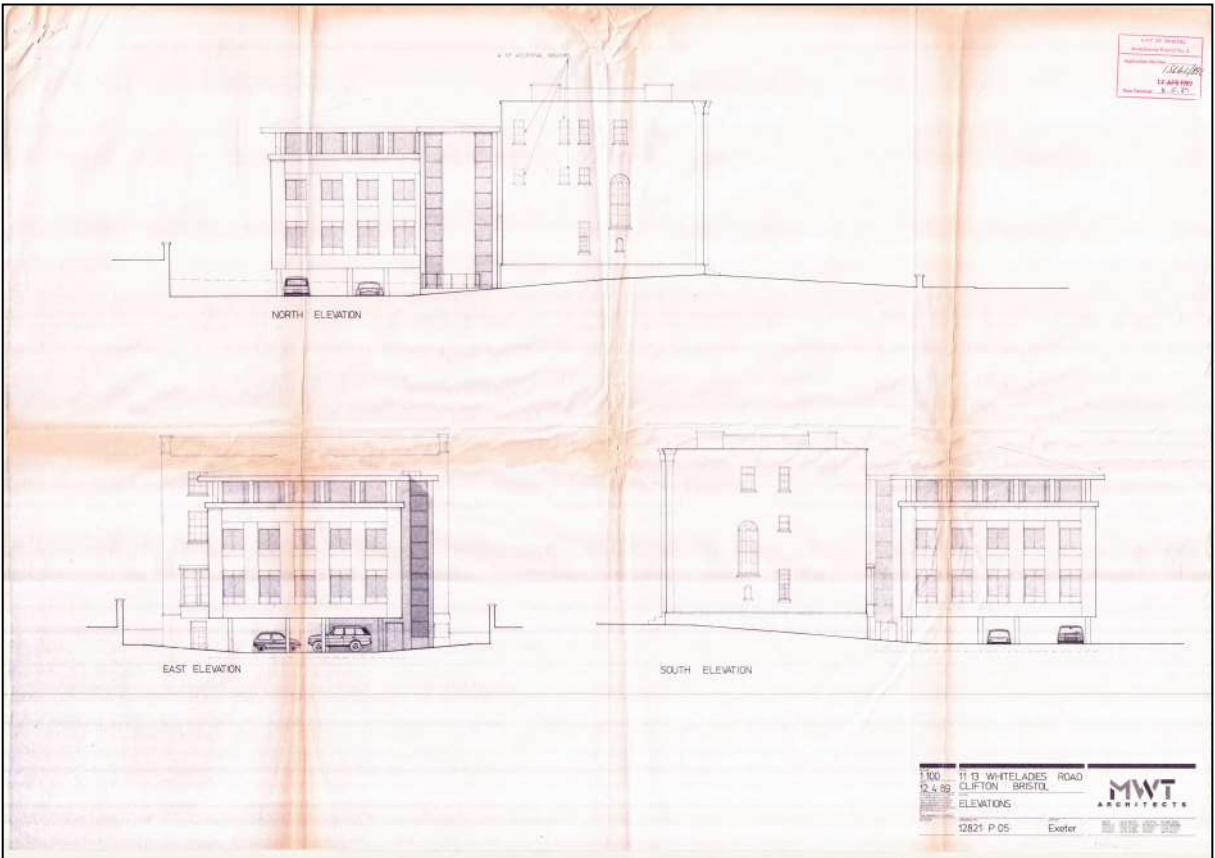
Elevation drawing from consented application for demolition of Annex and erection of a 4 storey office extension. Planning reference 89/01364/L. Never implemented
